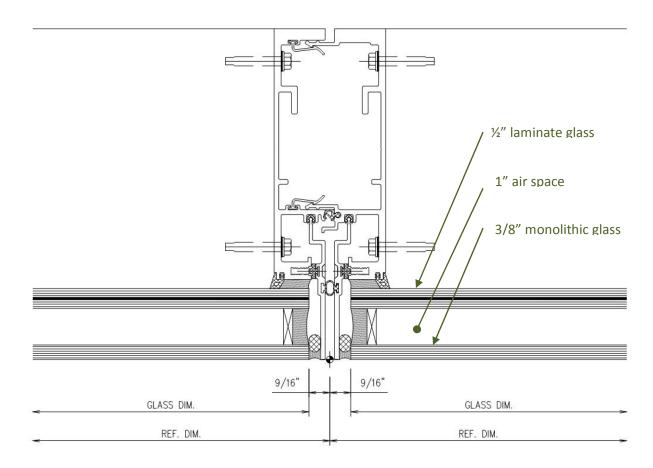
UNITIZED CURTAIN WALL SYSTEM SHOP DRAWINGS (COURTESY OF ENCLOS CORP), DETAIL AT THE JOINT (DIM. IS DIMENSION, REF. IS REFERENCE)
